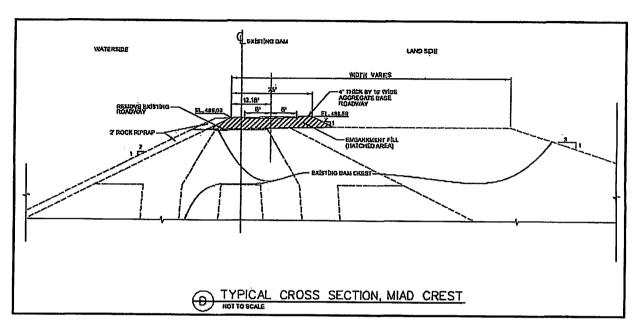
Preliminary typical cross section for 3.5-foot raise at Mormon Island Auxiliary Dam (MIAD).
